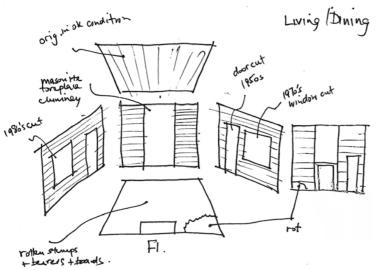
Sketch of 1952/3 Interior Modifications to Living / Dining Room
